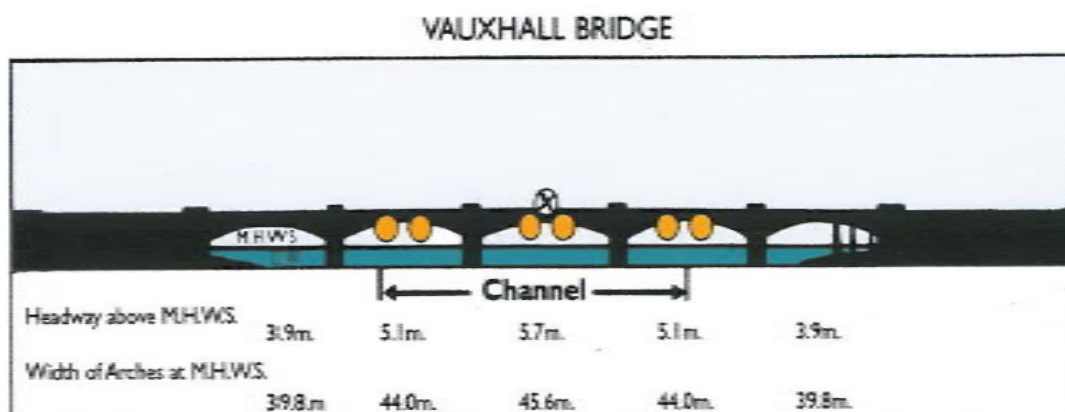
Vauxhall Bridge - Proceeding downstream
